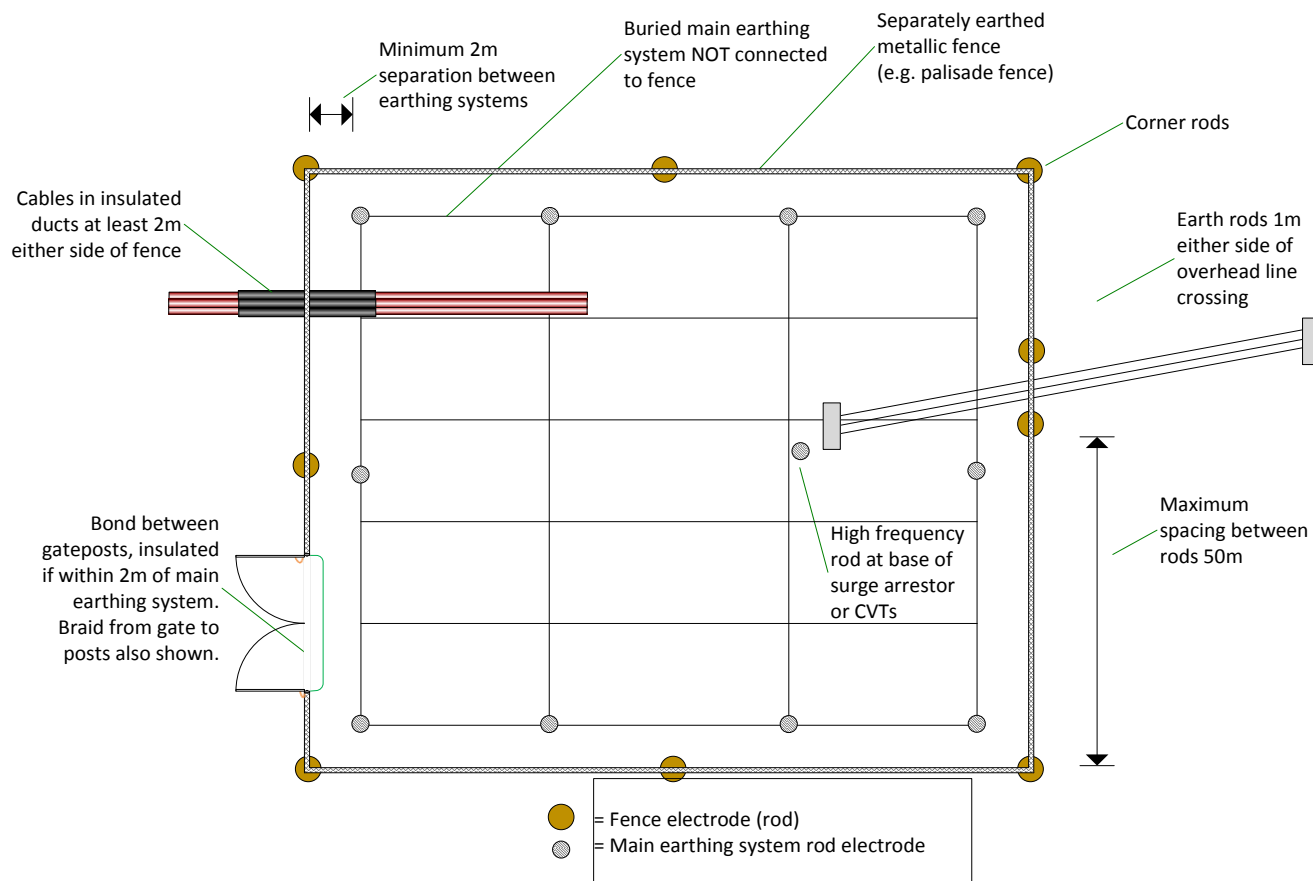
Earthing Layout with Separately Earthed Fence
